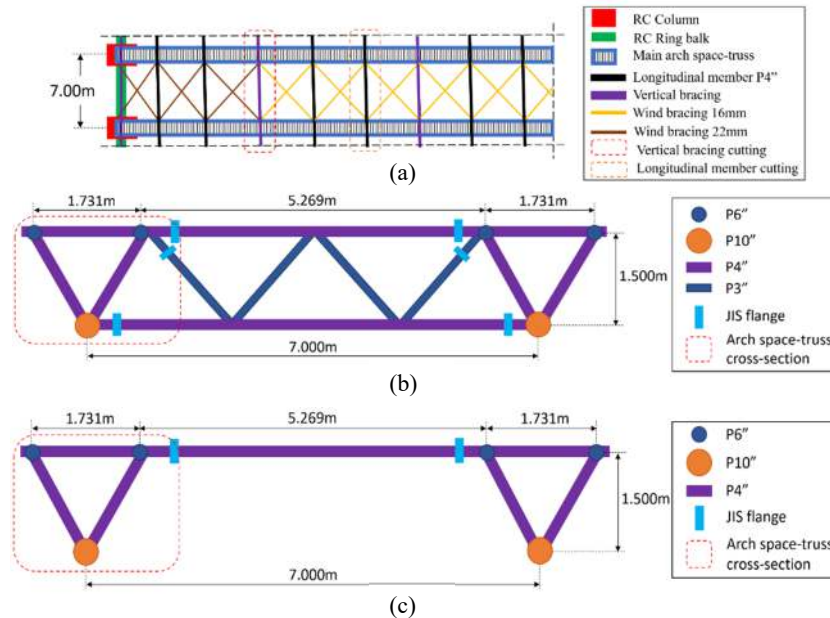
The detailed structural configuration of steel roof: (a) top view of main arch space arch with wind bracing and longitudinal member, (b) cut view of main arch space-truss cross-section with vertical bracing, and (c) cut view of main arch space-truss cross-section with longitudinal stiffener.
